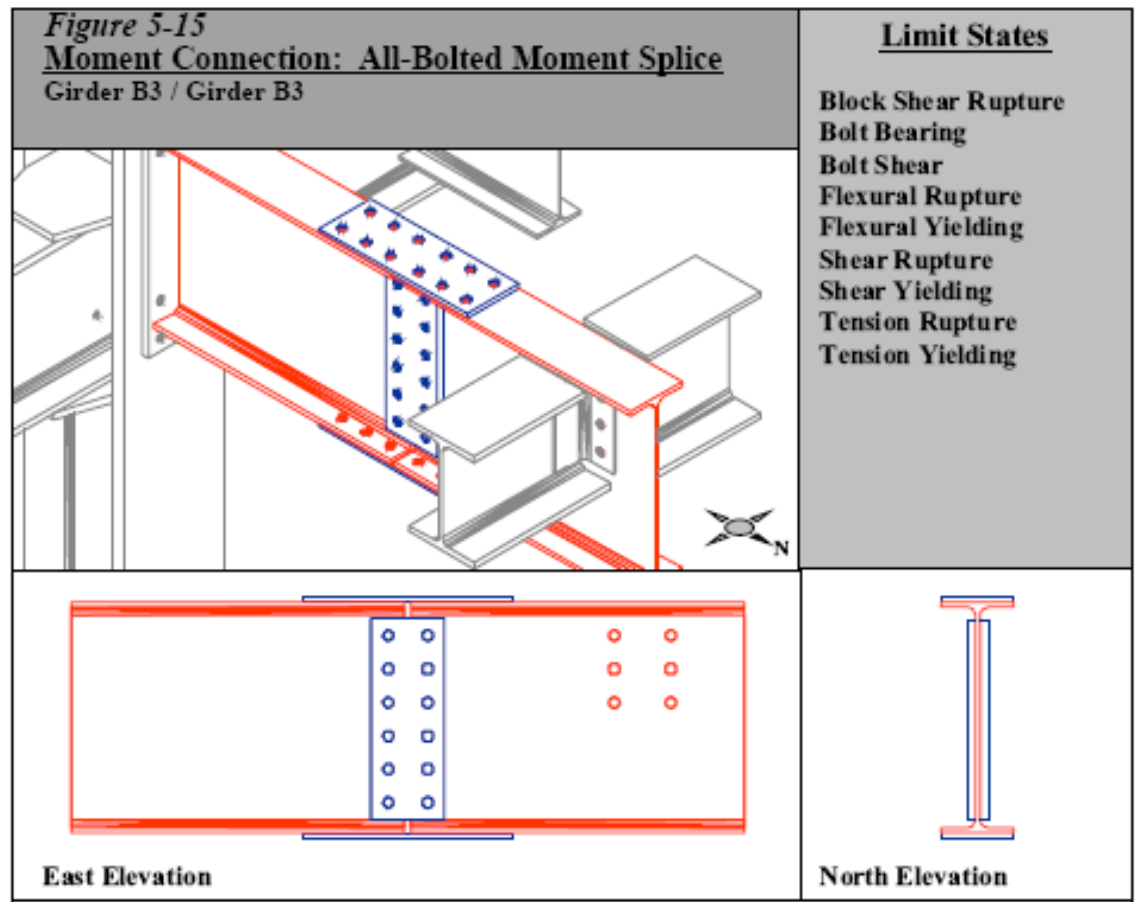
Moment Connection: All-bolted moment splice. Girder B3 / Girder B3
